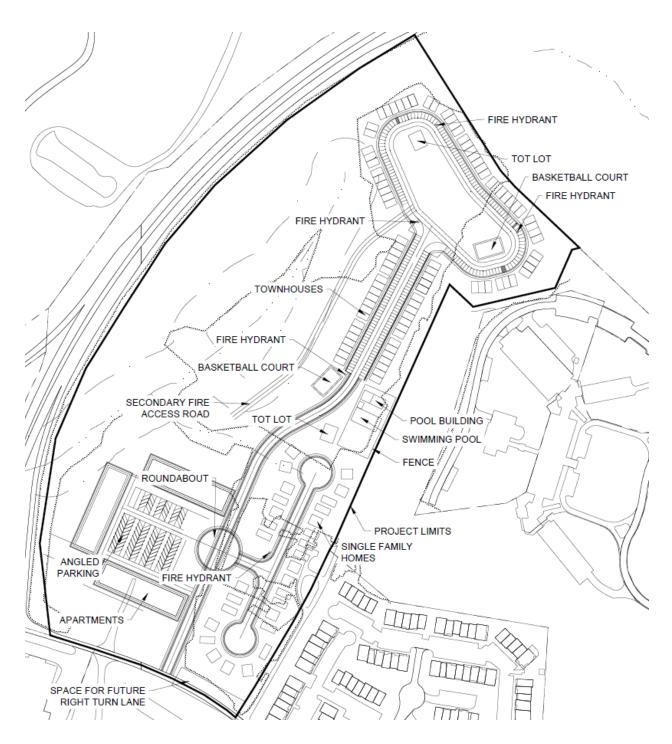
Preliminary Site Plan 75% (November 11, 2023)
